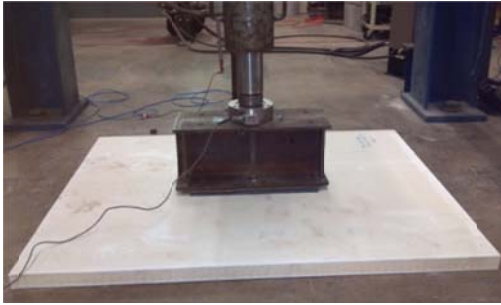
Single-layer panel (under testing at the WVU-CFC lab)
